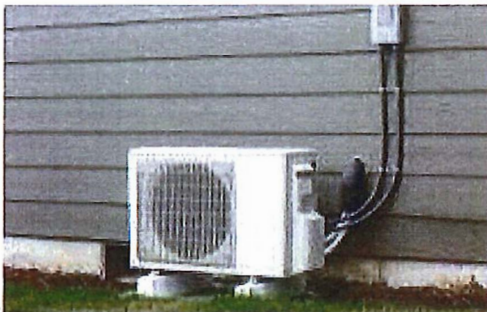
Ductless heat pump outside compressor. Image source: [Ductless \(Mini-Split\) Heat Pumps](#), Building America Solution Center ([bamf.gov](#))
